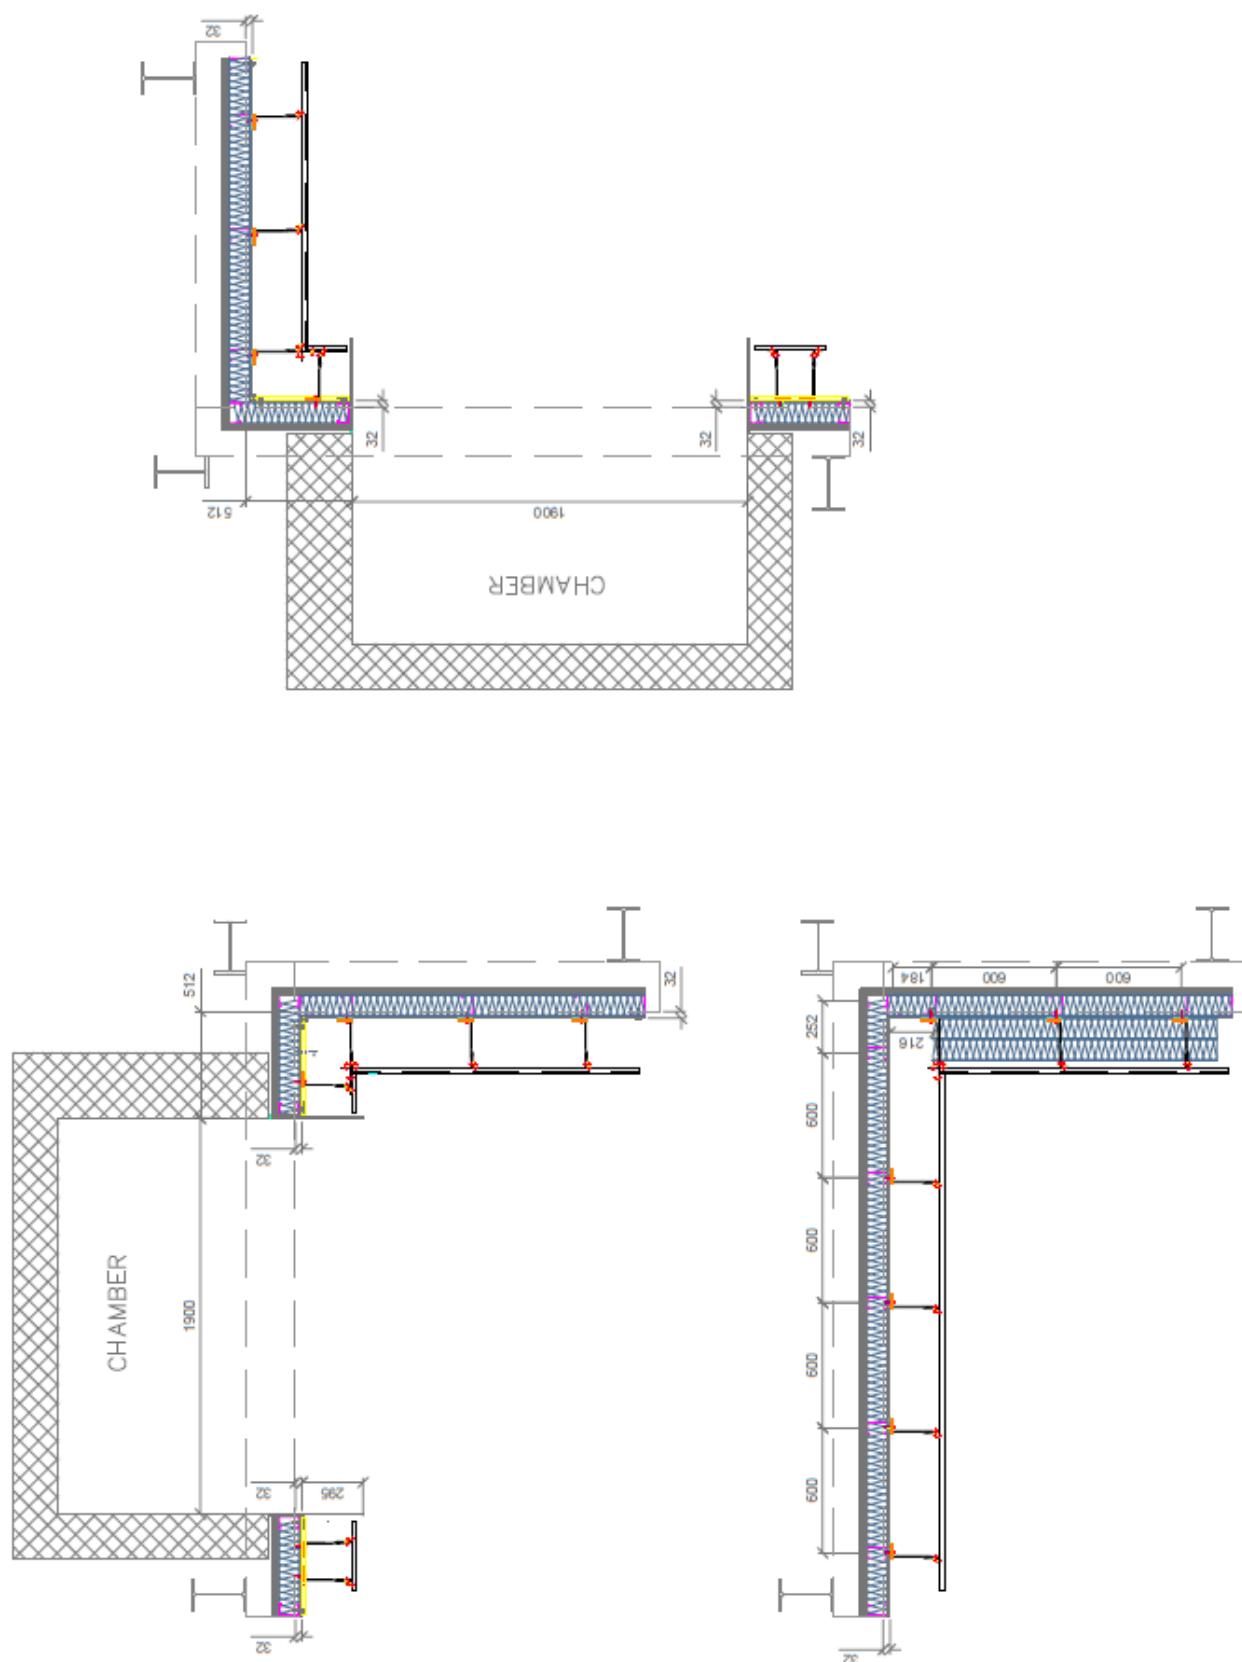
Sketch of façade system detail. Plan layout of SFS.
